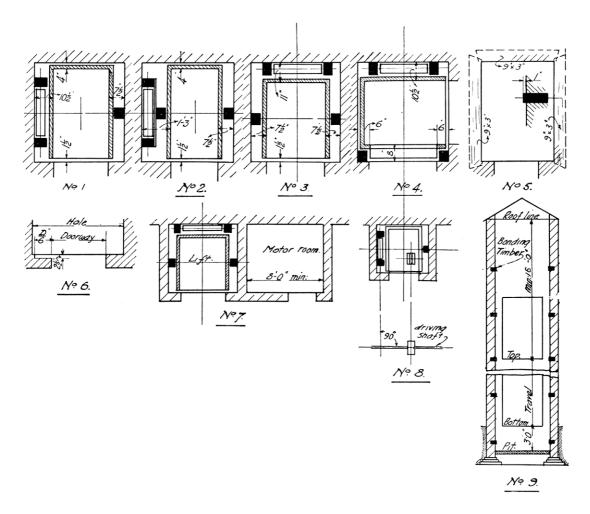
Lifts Plans and Section: "How to determine the size of car and dimensions of lift well," Wadsworths: Lifts, Transporters, Hoisters (c. 1920).
